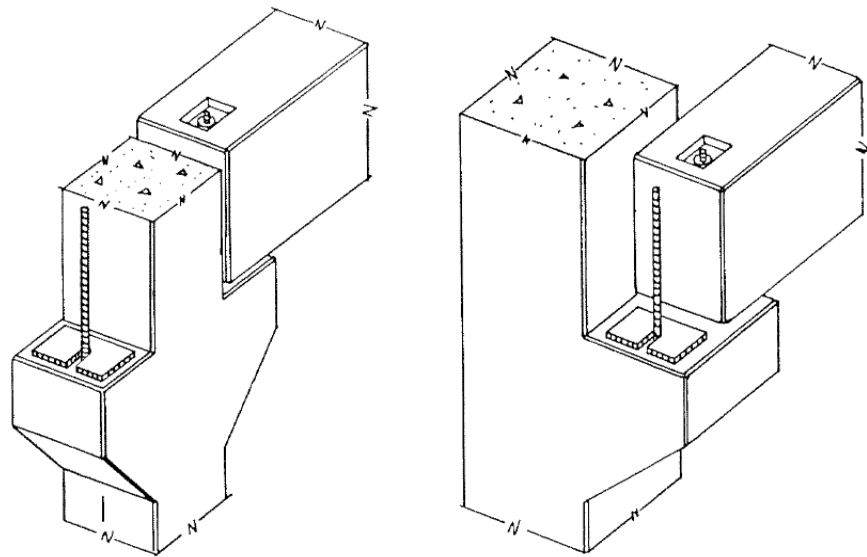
Examples of beams connected to columns, from *Betongindustriens Landsforening* (1996).
